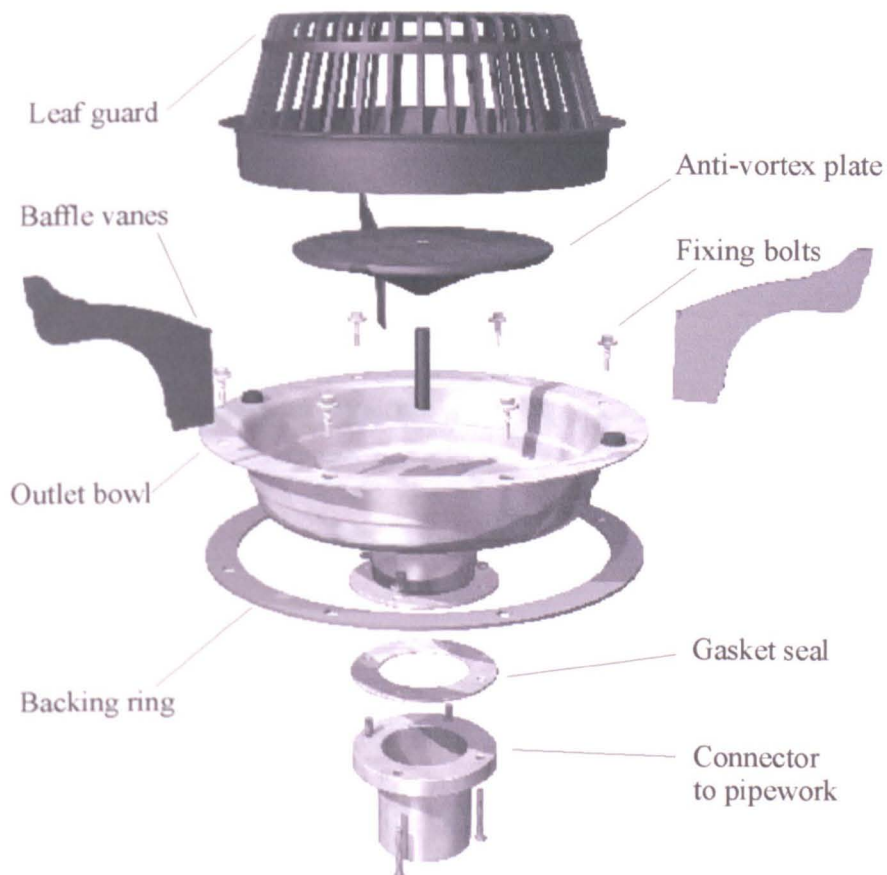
Component parts of a typical syphonic roof drainage outlet.
